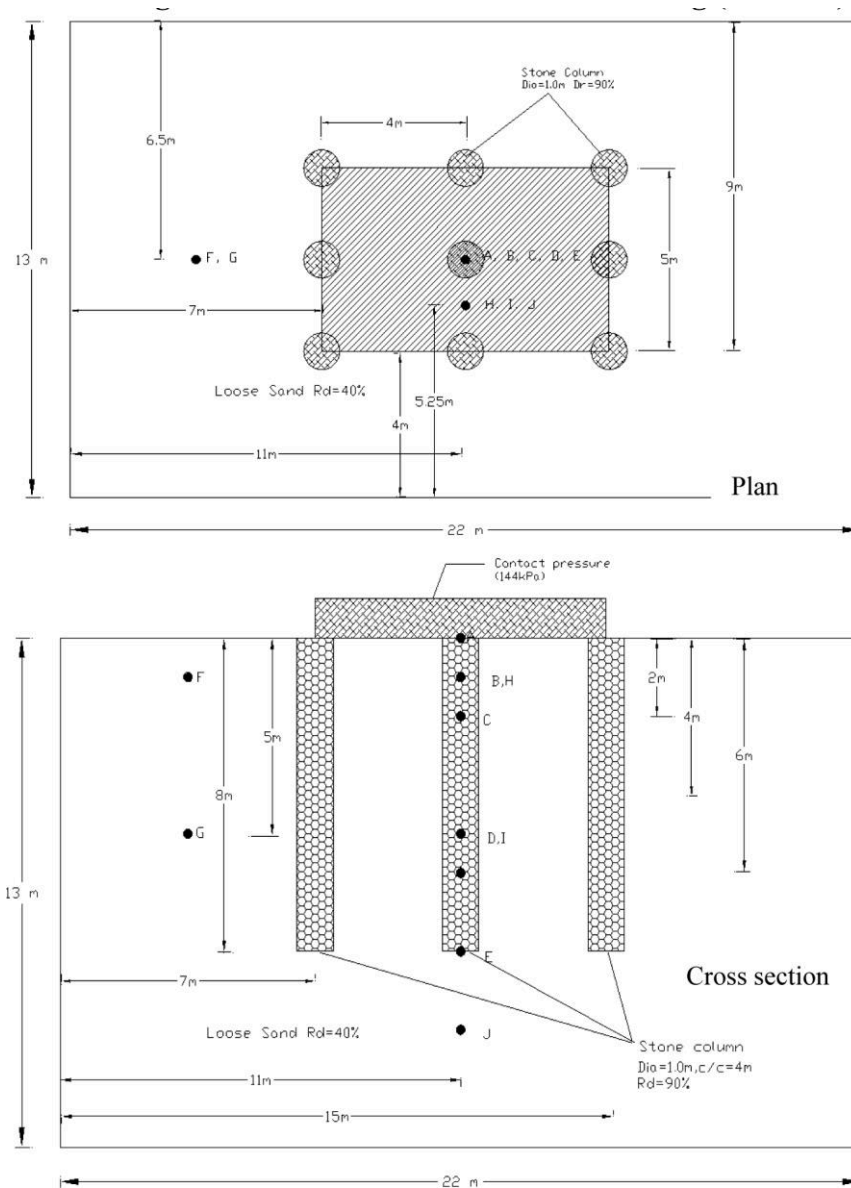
b. Benchmark model with Footing and stone Column (Model 2)
